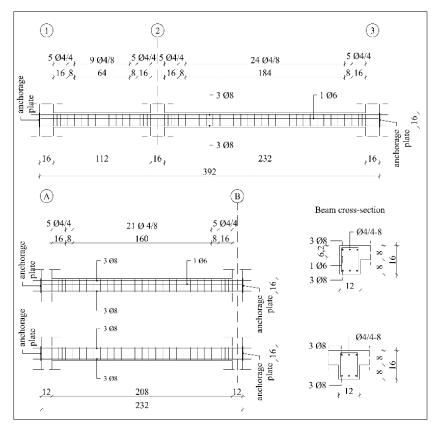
Beam reinforcement details (units in cm except for bar sizes)
